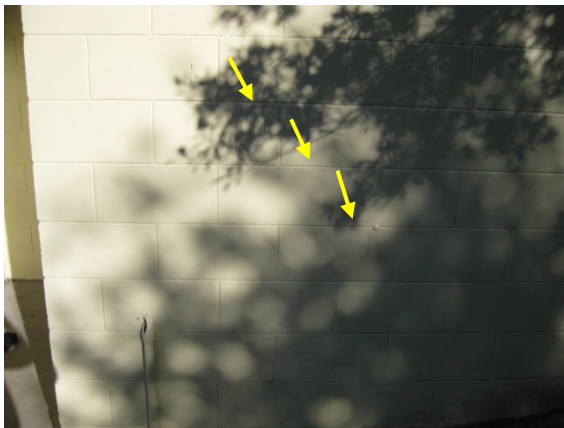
Hairline Cracking along Mortar Joints on West Wall – External View
